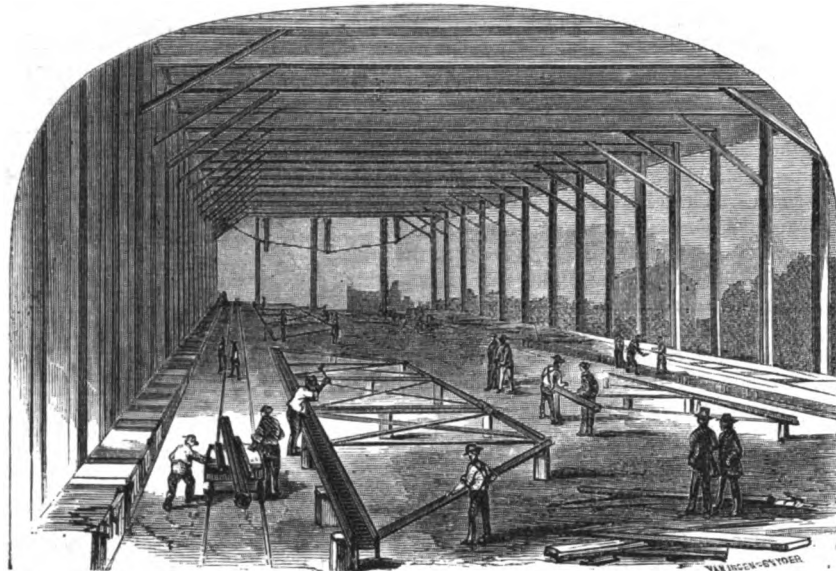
ASSEMBLING BRIDGE UNDER SHED.
